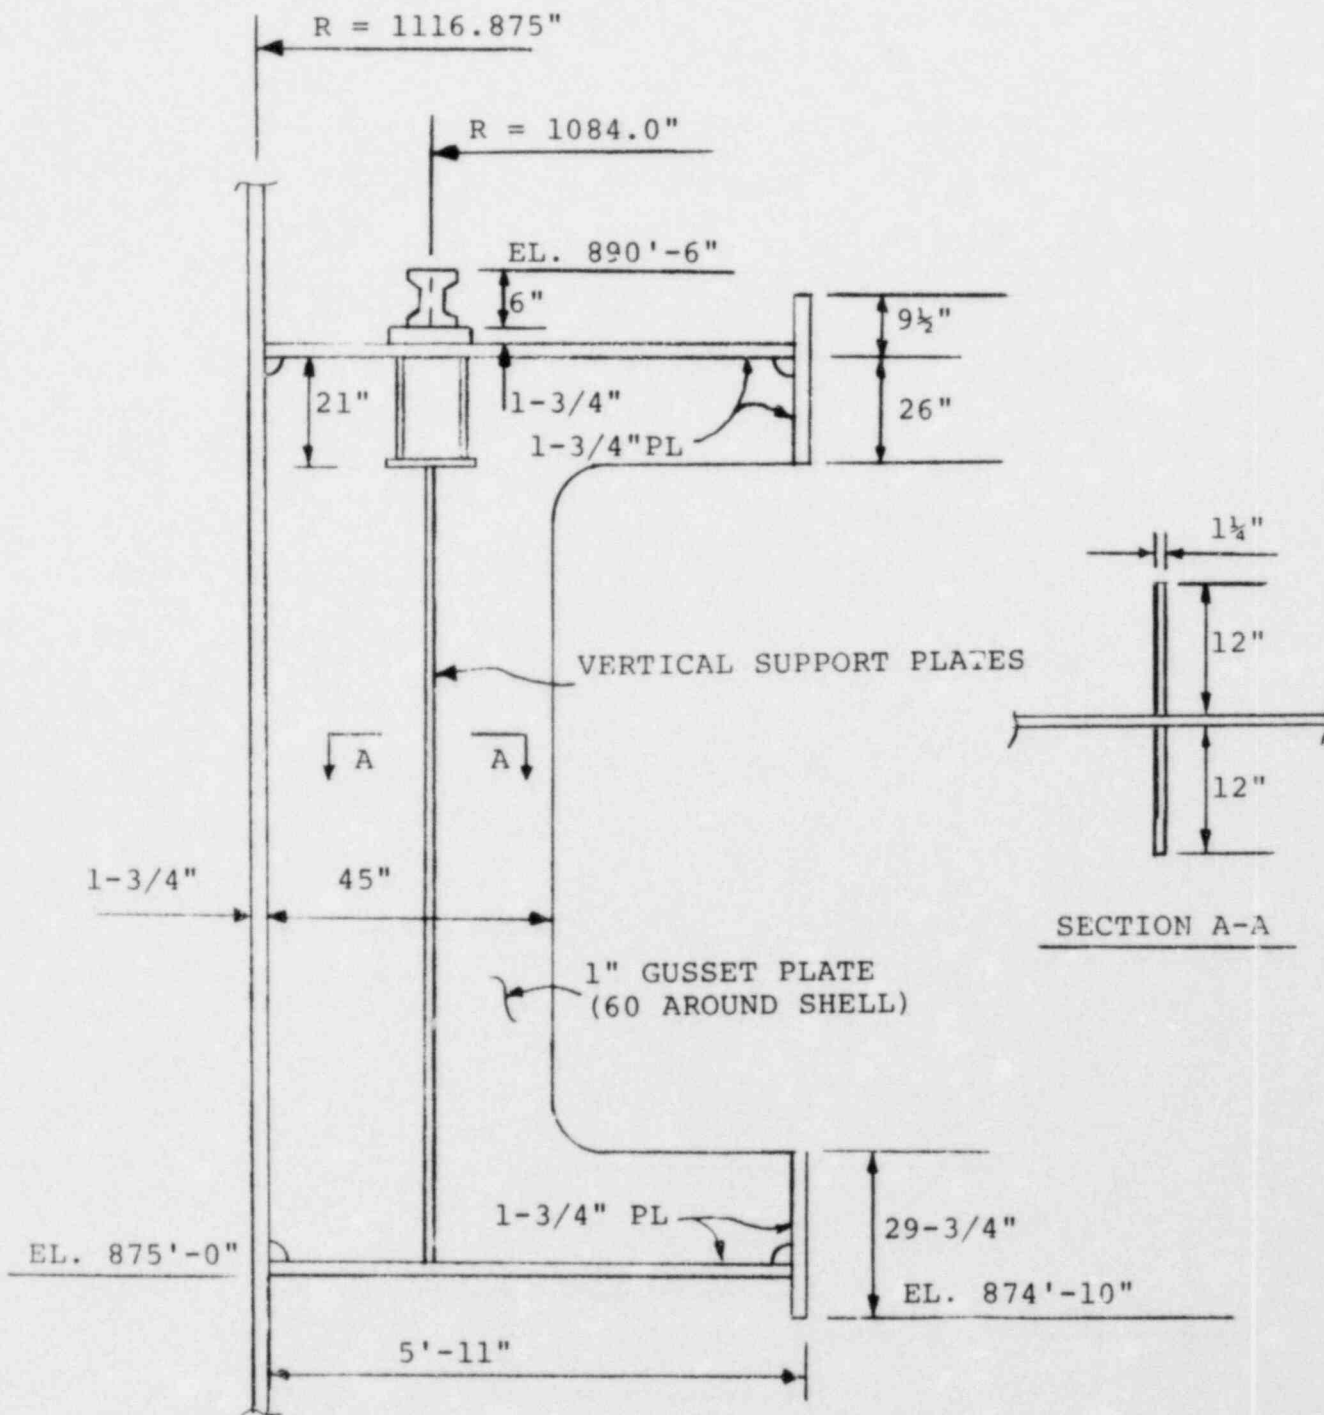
(d)-2 SECTION THRU CRANE GIRDER SUPPORT
